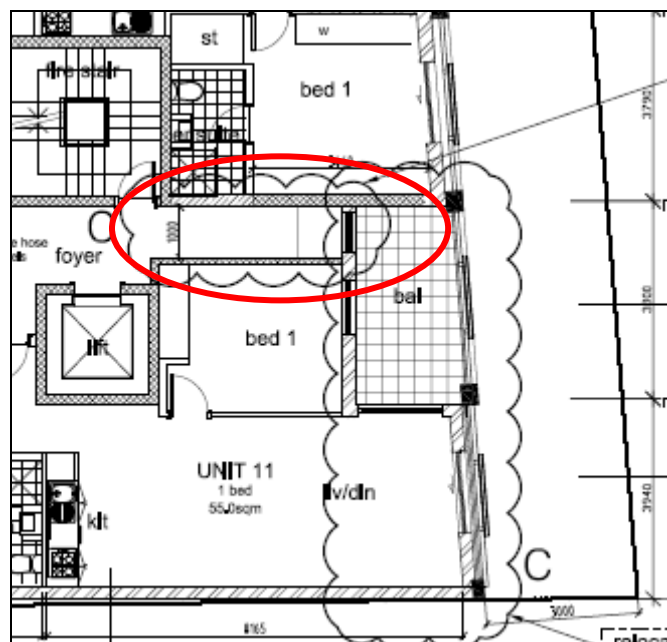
Corridor from foyer to window providing natural Light and Ventilation on each level
